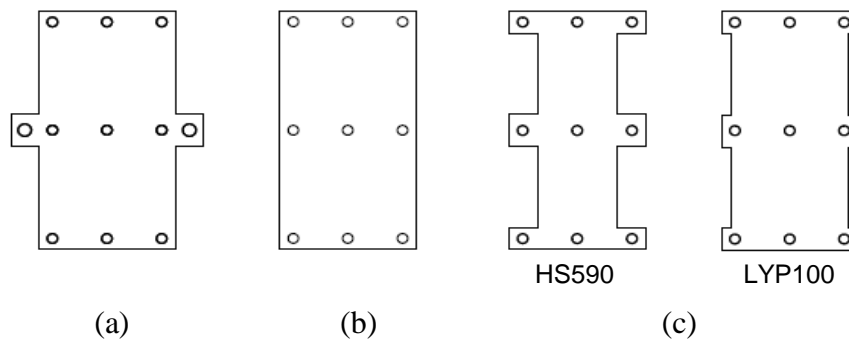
Shape of bending plates: (a) Specimen 1 and 3-5; (b) Specimen 2; (c) Specimen 6.
